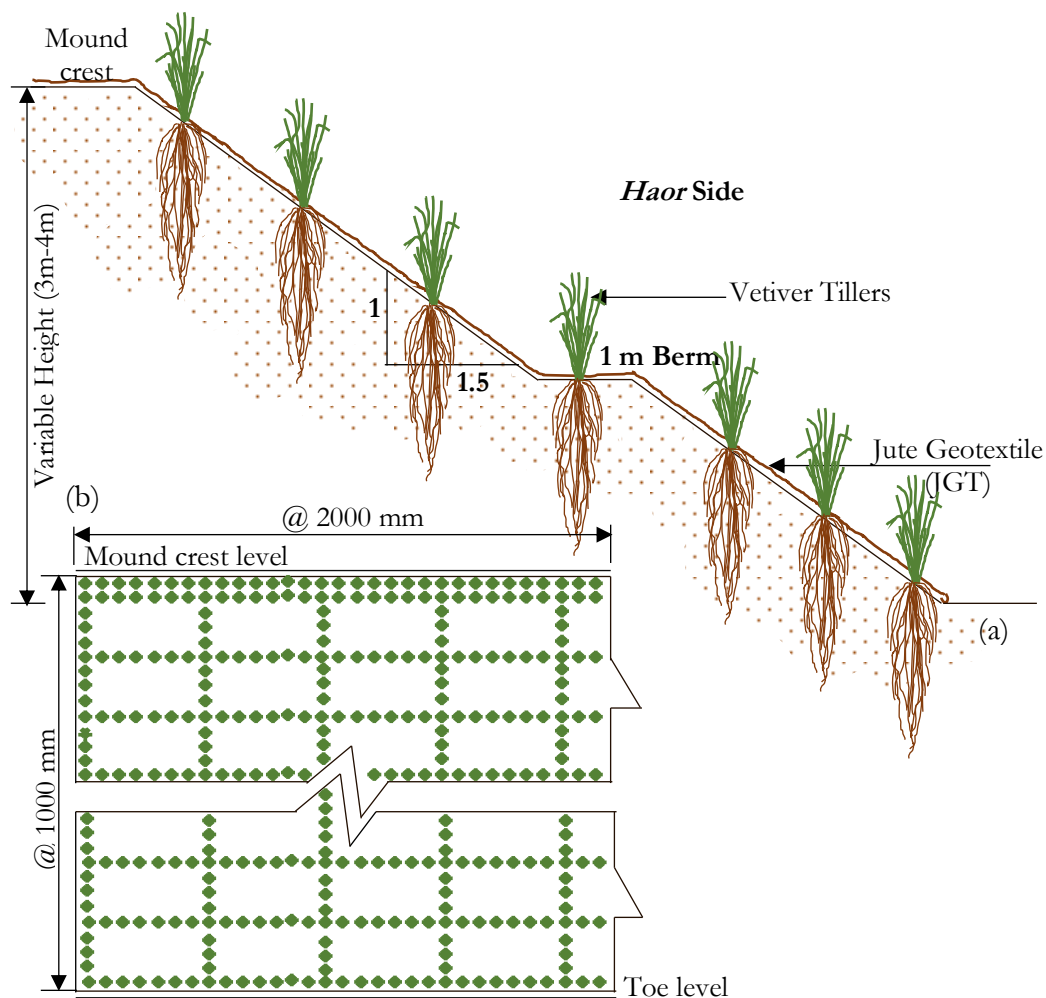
Schematic Drawing of Design Type II, (a) Cross Sectional View; and (b) Plan View (Redrawn from HILIP, 2017)
